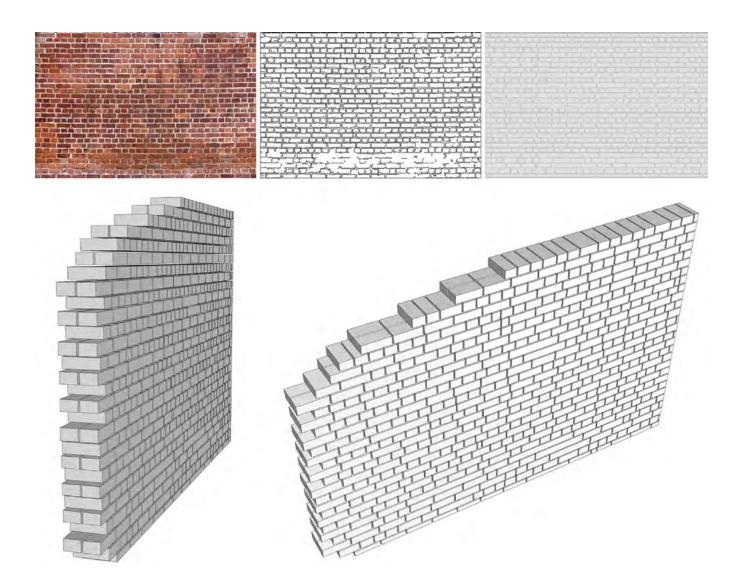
Detail of a 3D reconstruction (some bricks have been removed to show the section of the wall).
